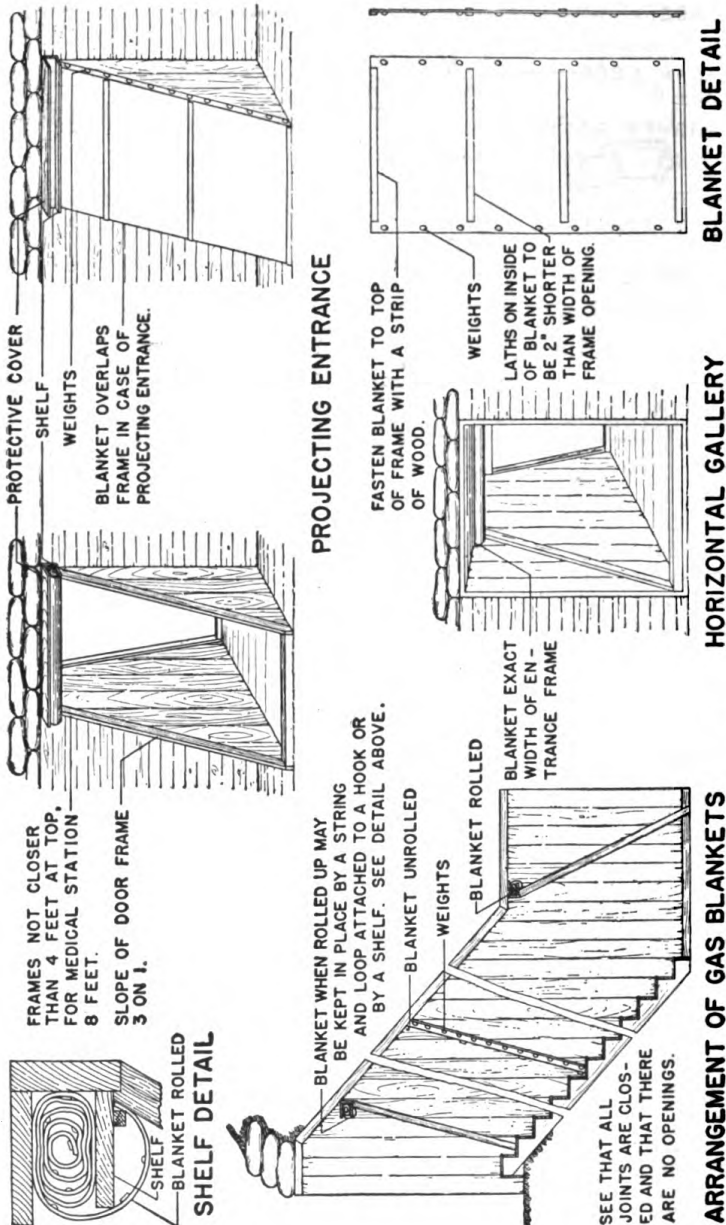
Typical arrangement for gasproofing dugouts.
